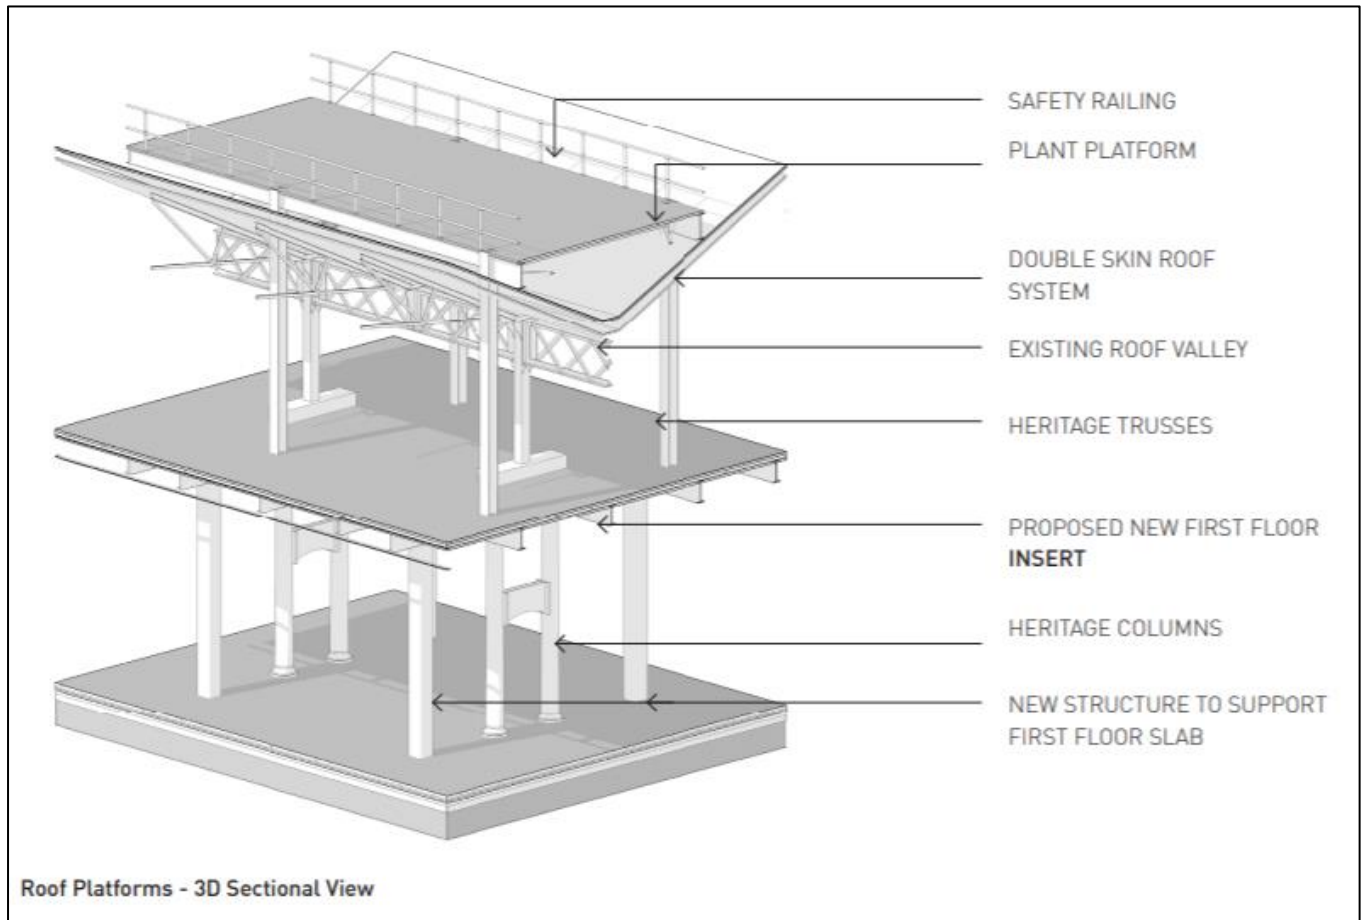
DETAIL OF ROOF PLANT PLATFORMS (SISSONS RTS 2018)
